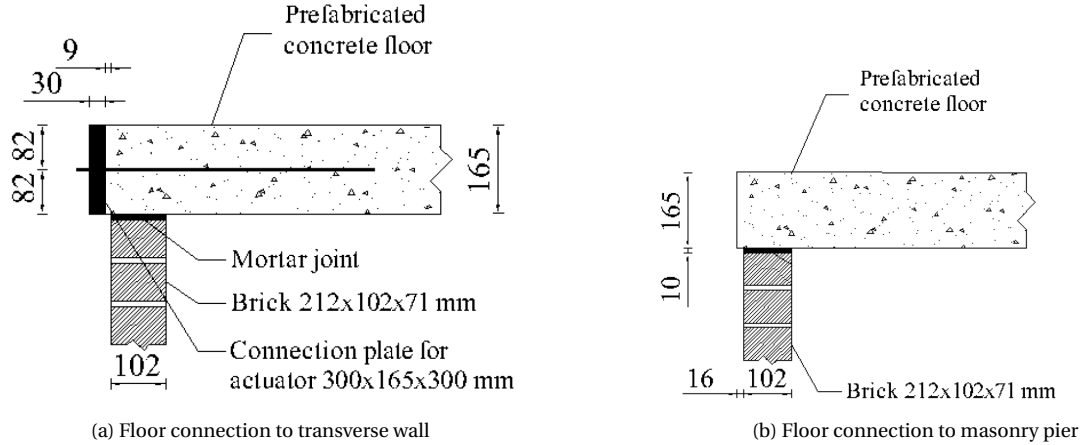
Construction detail of second-floor connections as depicted by Ravenshorst *et al.* [1]
